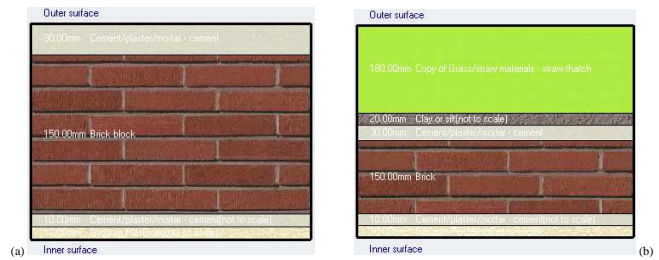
Bare wall (a) and Green wall (b) layers (Plotted with Design Builder).
